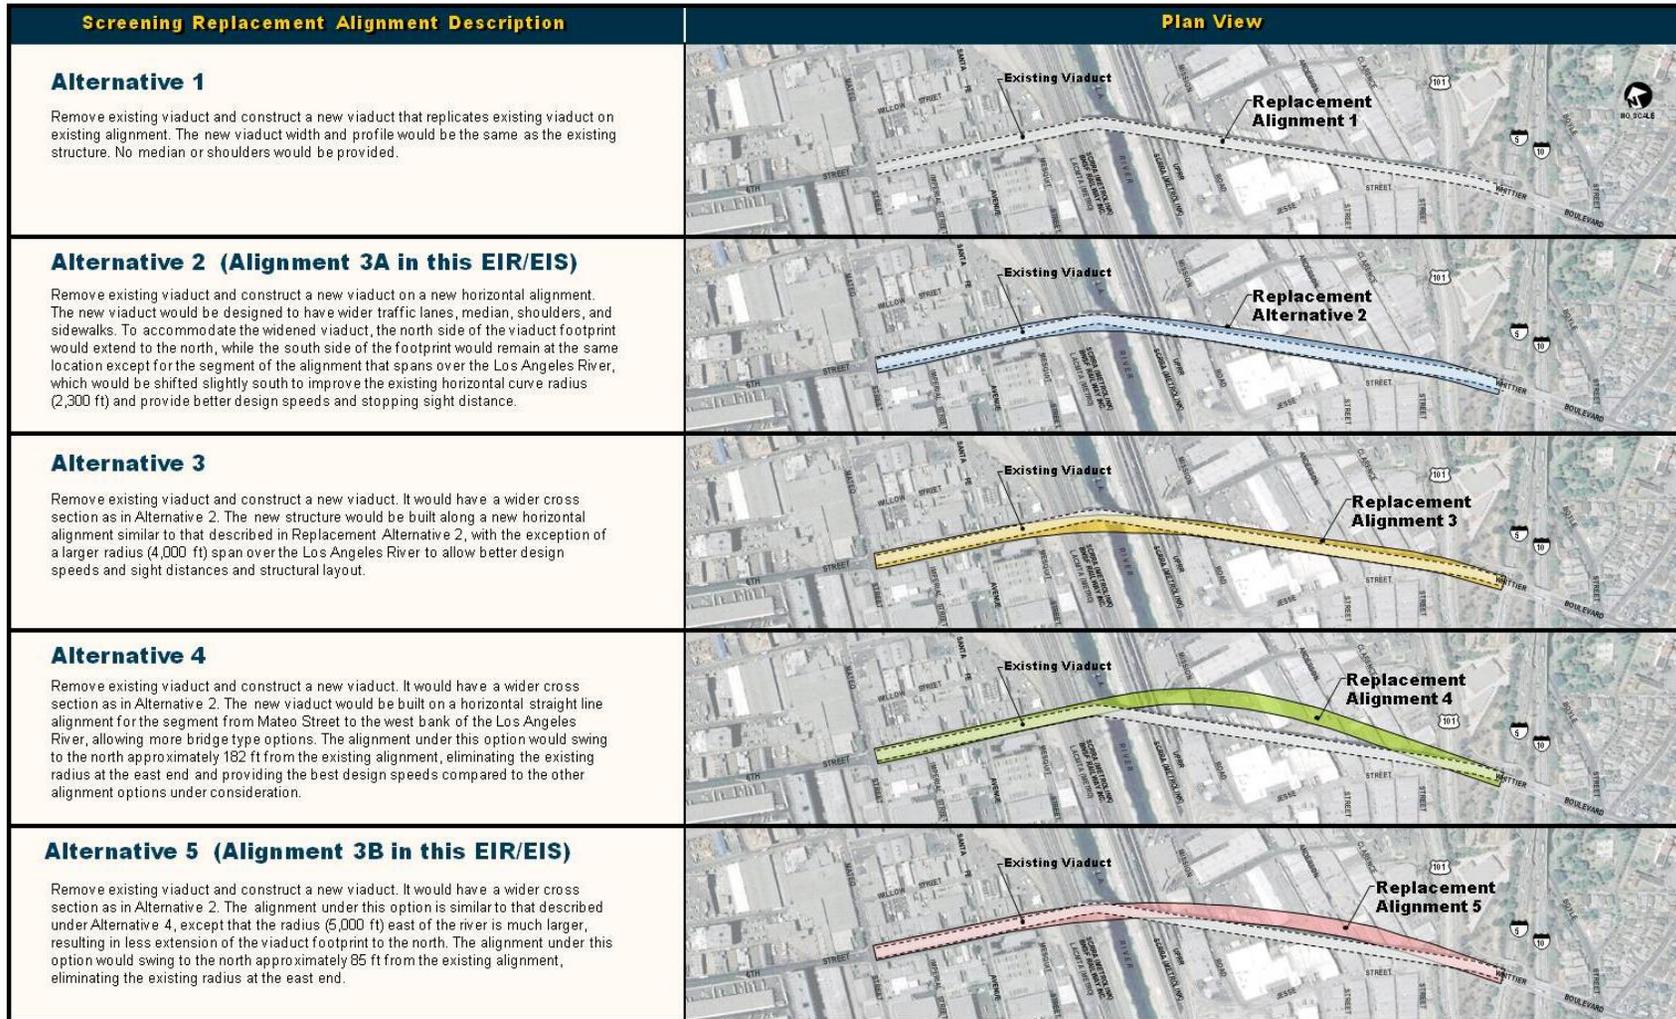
Replacement Alternative Alignment, Sheet 1
